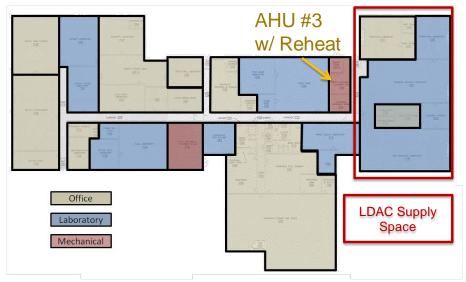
Tyndall AFB building layout. (Illustration by Jesse Dean, NREL)
